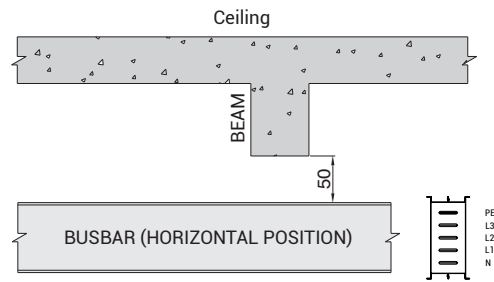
BEAM PASSAGE HORIZONTAL POSITION
